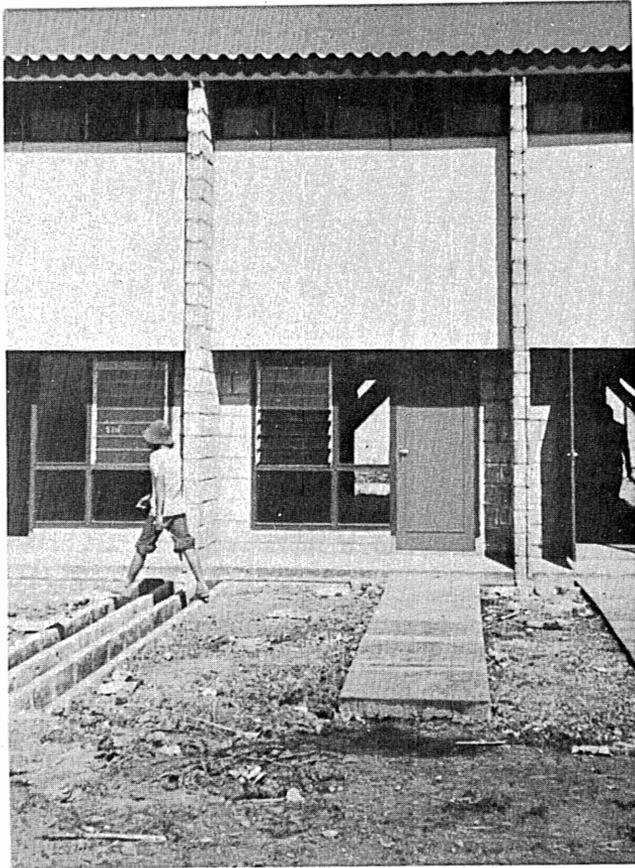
Facade showing asbestos cement roofing, puzzolan cement hollow blocks, and pre-manufactured front walls, windows and doors.
